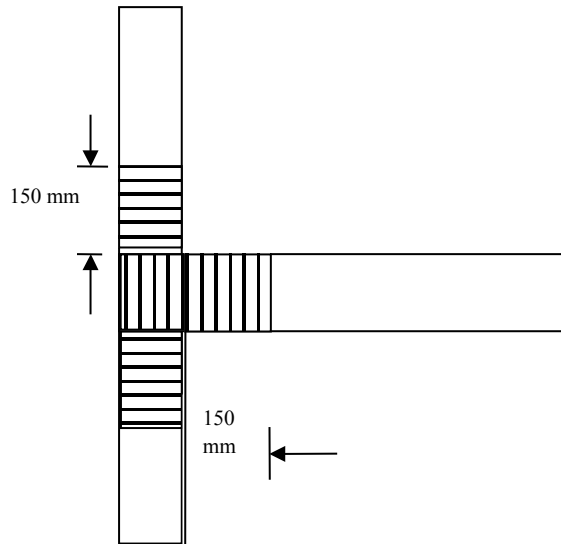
Details of Wrapping by CFRP Fabrics
